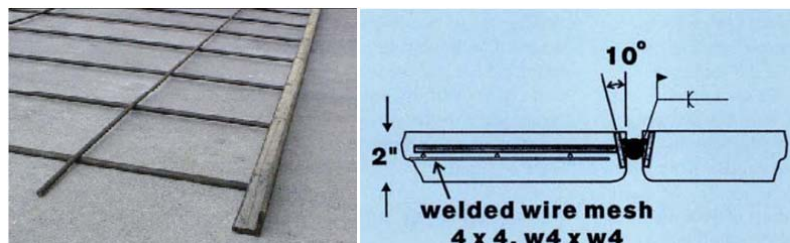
overall view of mesh and angle (M&A) connector (2 and 4 in. flanges)
